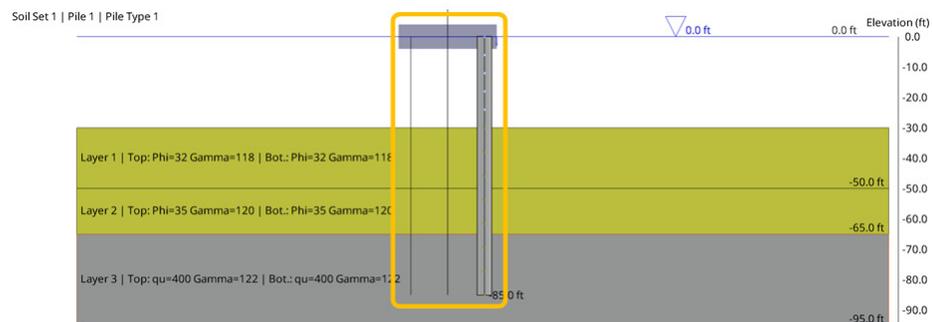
Soil Edit window with selected pile, soil layering, and foundation “silhouette”
